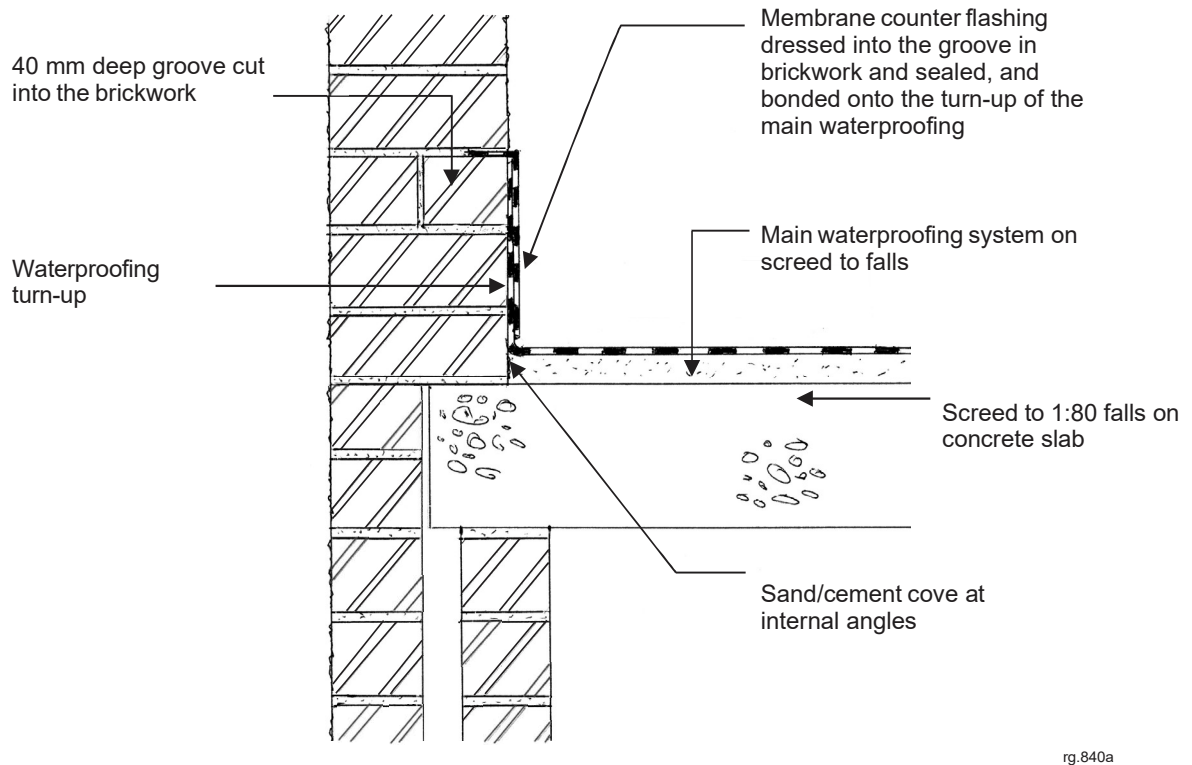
Waterproofing turn-up detail against solid brick wall
